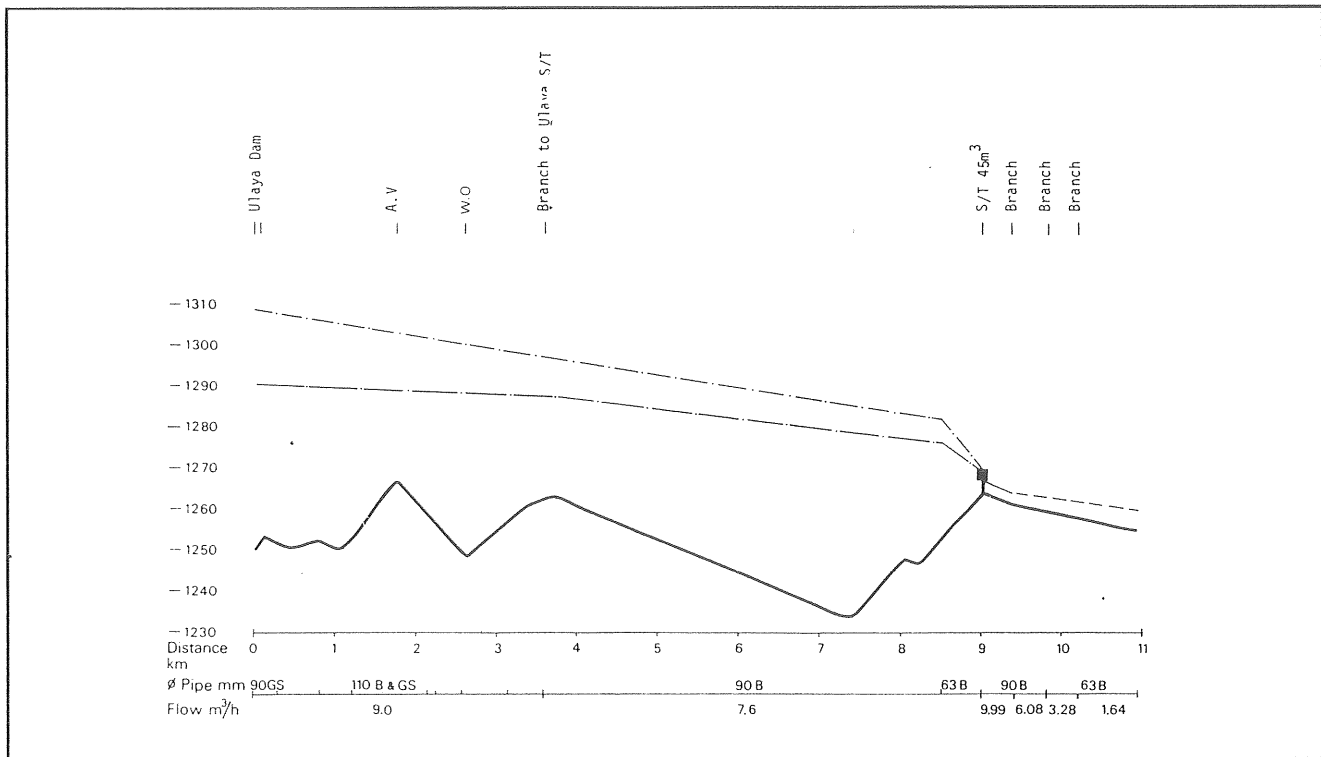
Longitudinal section of the pipe to the Ndembezi Water Tower.
